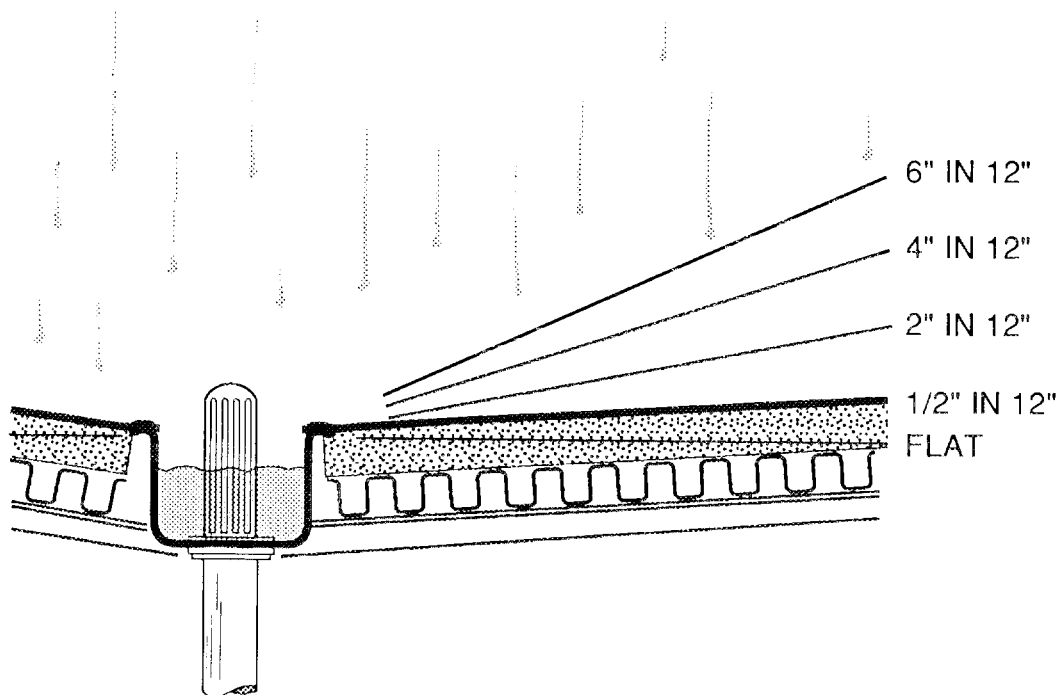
The slope of a waterproof roof enables gravity to move water to the drains. Once a positive slope has been achieved, increasing the slope only increases the rate of runoff and the potential size of a pond should the drain become plugged.
